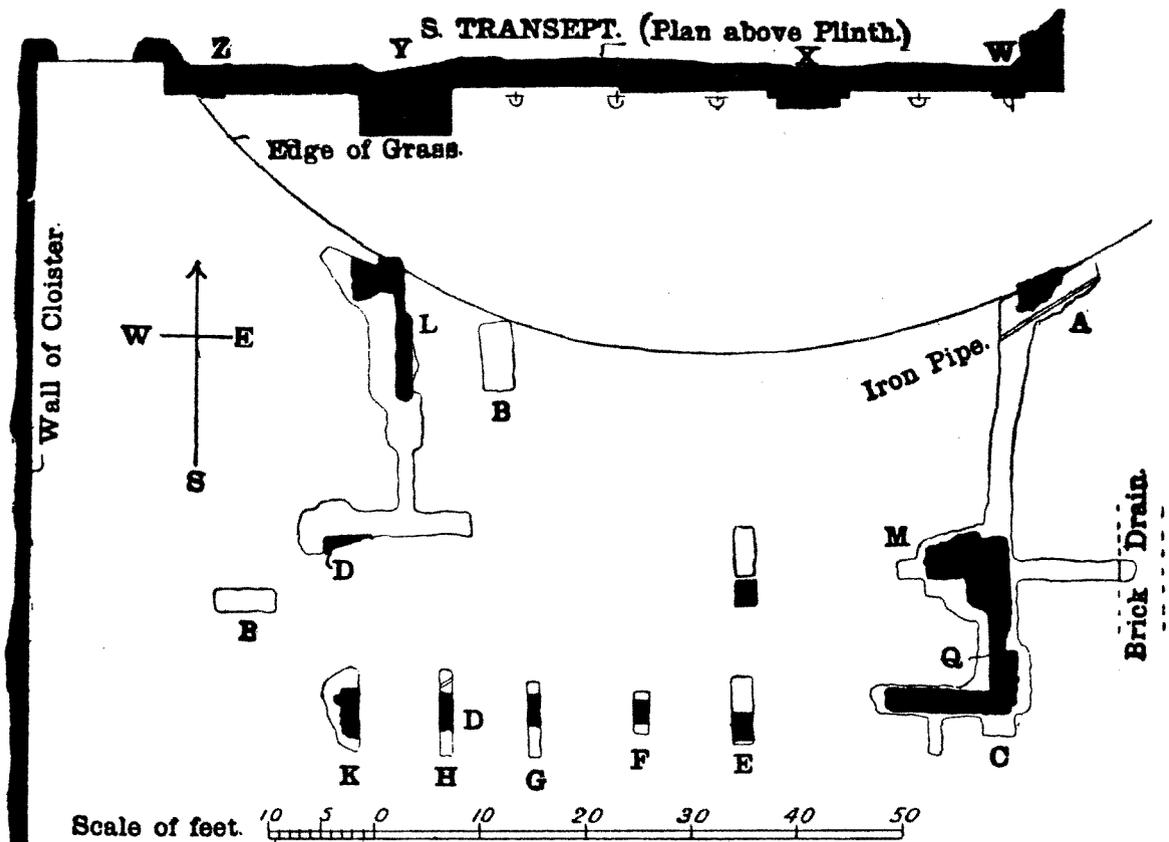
Excavations on the site of the Chapter House at Ely Cathedral.
